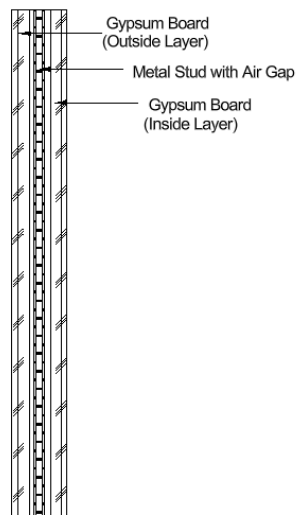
The Construction Design for the Montpetit Hall Interior Wall
